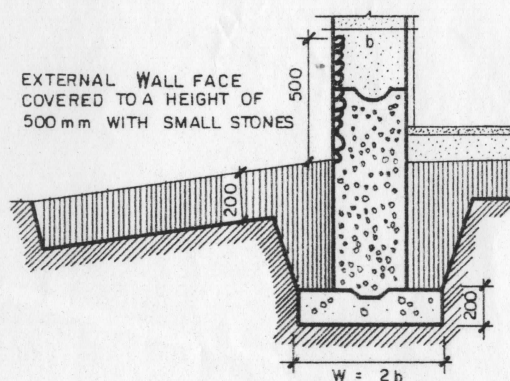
Reinforced concrete strip foundation suitable for attackpame, sun-dried brick, adobe or burnt-brick walls in areas where both heavy rainfall and earthquakes occur (after ref 11)
